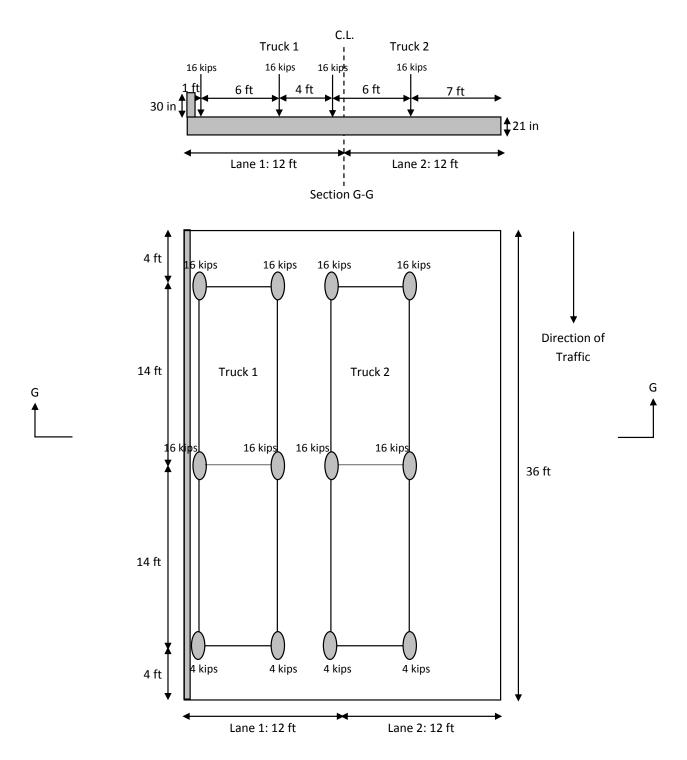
Typical Cross-Section and Plan of a Two-Lane 36 ft straight Bridge with one Railing(Left) under Edge Loading E1.
